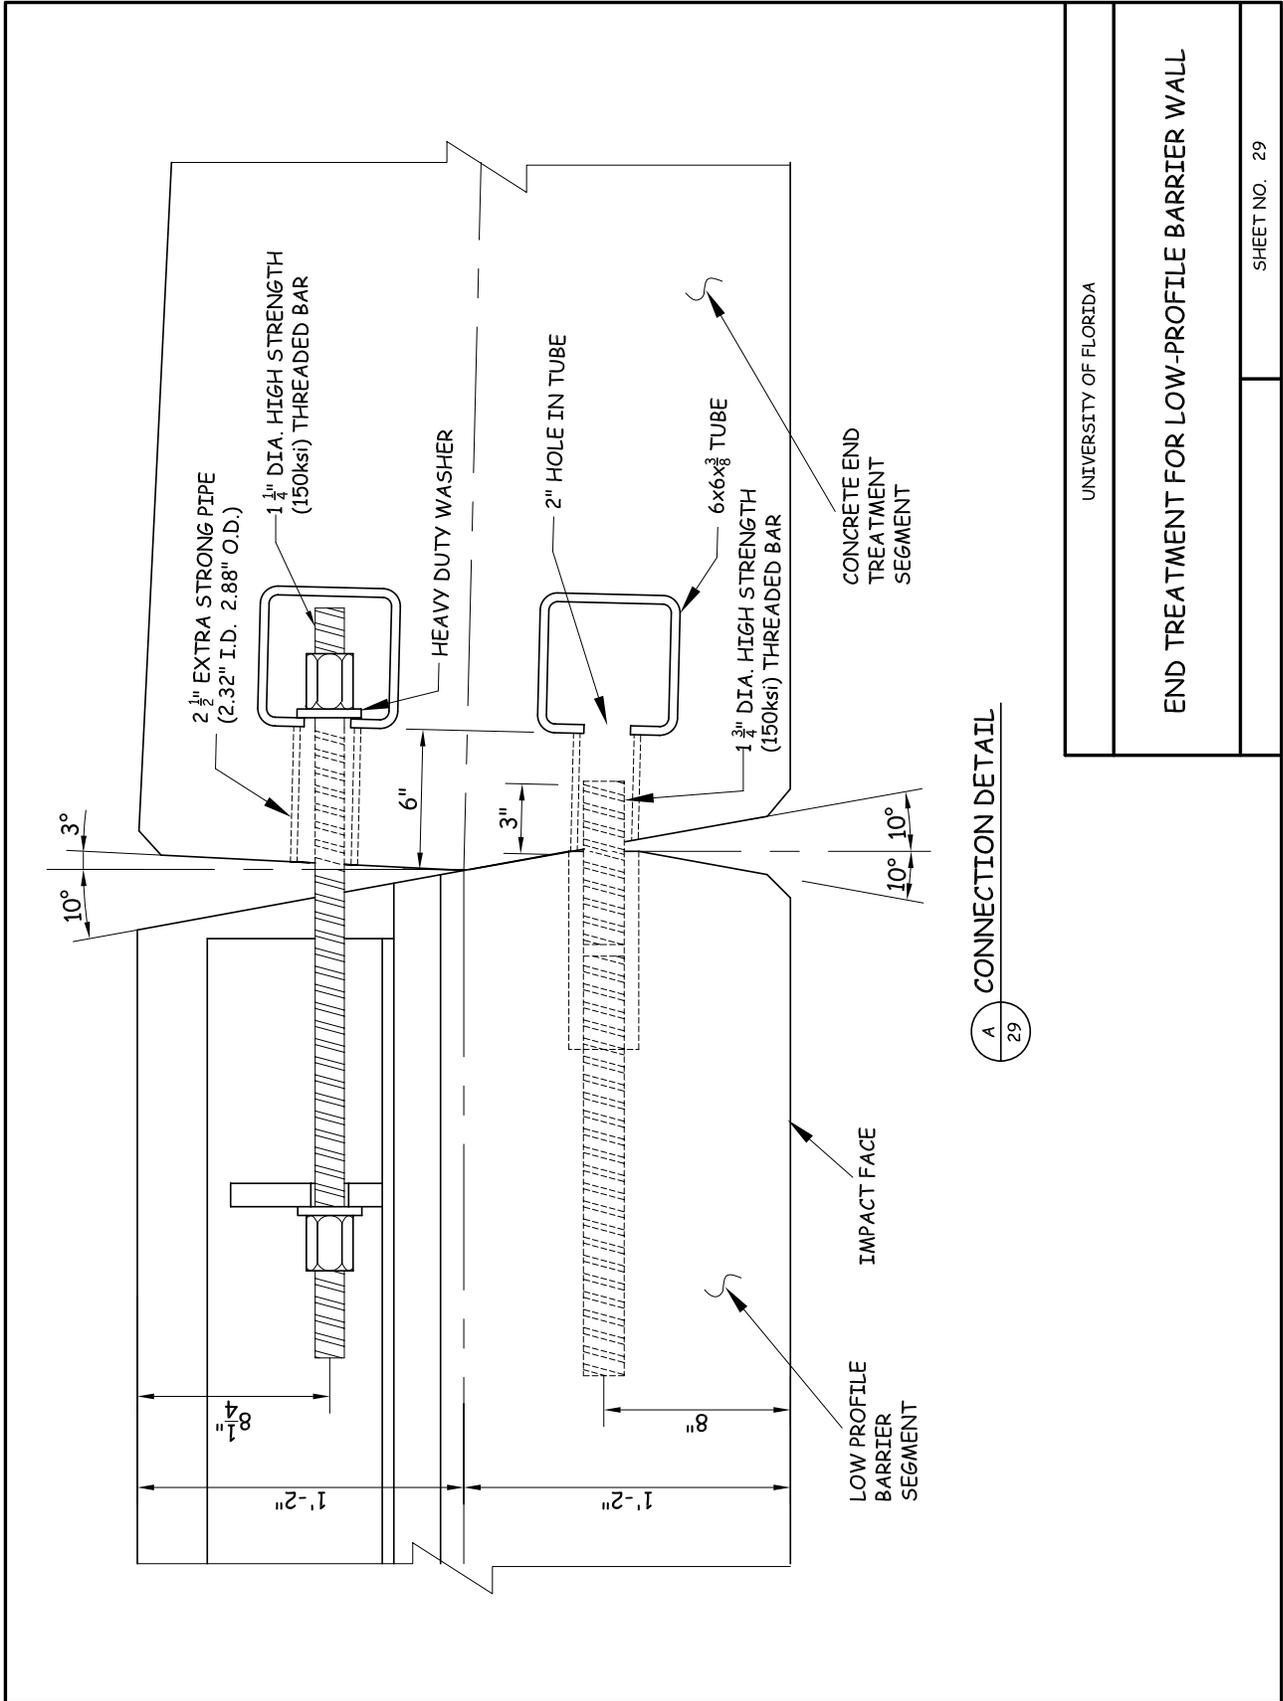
Drawings of Florida Concrete Curb End Treatment (13 of 14)
